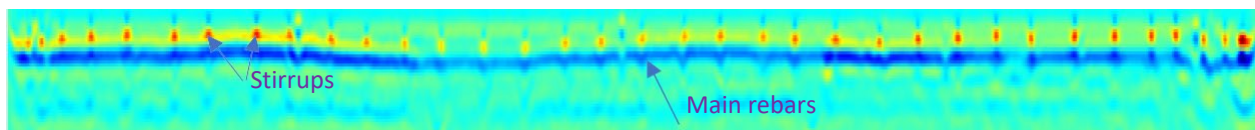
2D reconstructed images along CR 30 Bridge box girders (obtained from GPR top scan)
